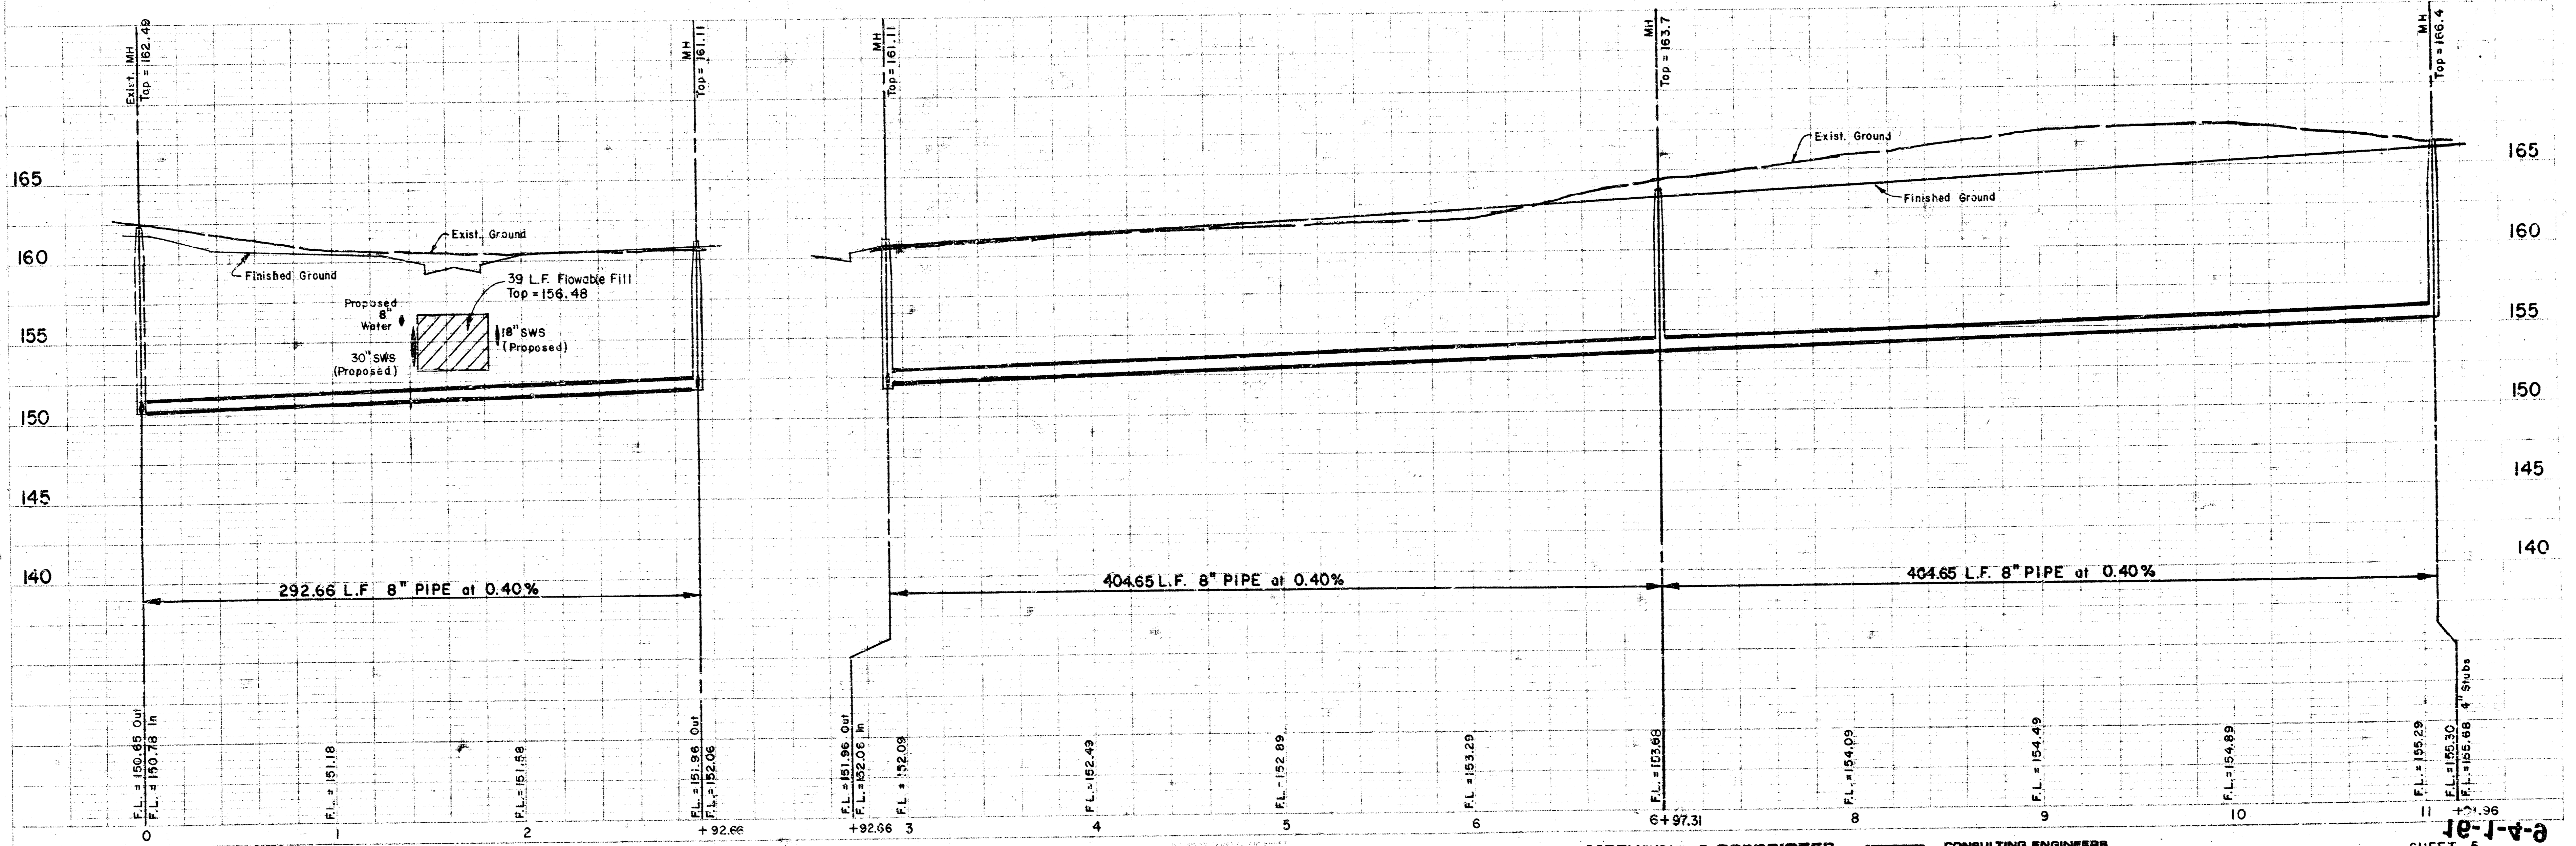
SINGLE PLAN AND PROFILE-FULL LINE
